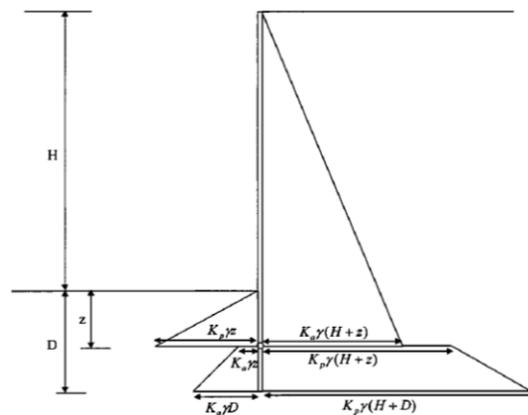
Active and passive earth pressures on cantilever retaining wall when soil has friction angle of  $\phi$  [1]
